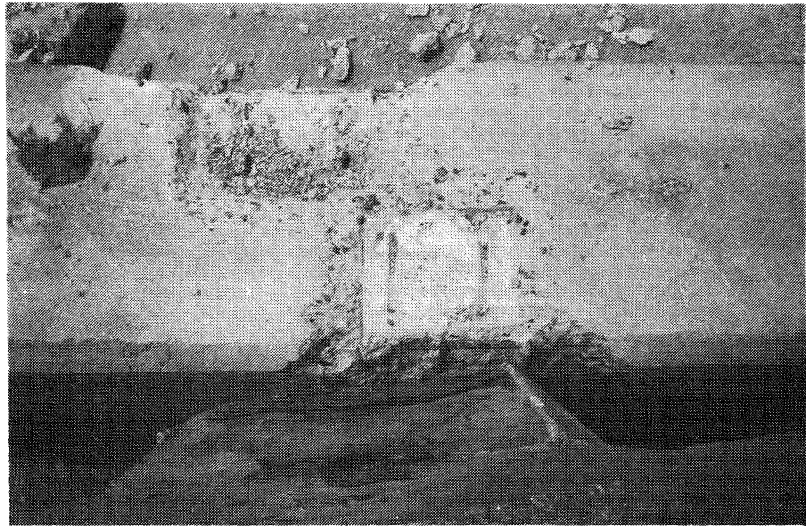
Rizal Canal Bridge; cast-in steel bearing plate to support reinforced concrete bridge beams, view down onto pier cap. The bearing plate has two longitudinal ribs, 25mm high, formed on the lower and upper surfaces to provide a key into the pier and beam to resist transverse loading
